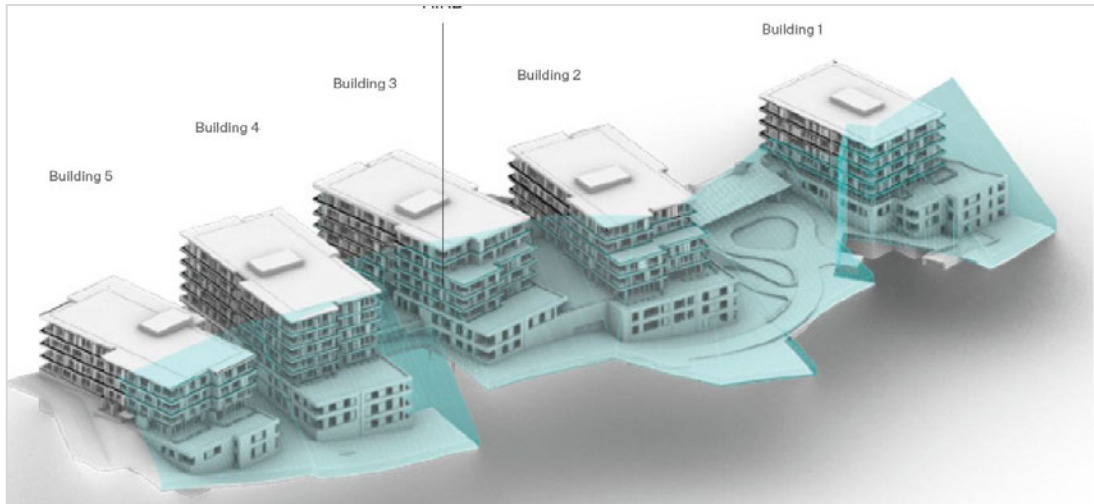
View looking north-east showing HIRB compliance (Source: Sheet 34 – ADR).
